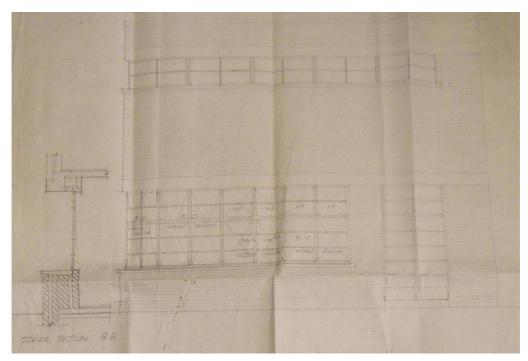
Detail from Plan Showing Elevation of Former Geography Room (W. H. Wingage)
